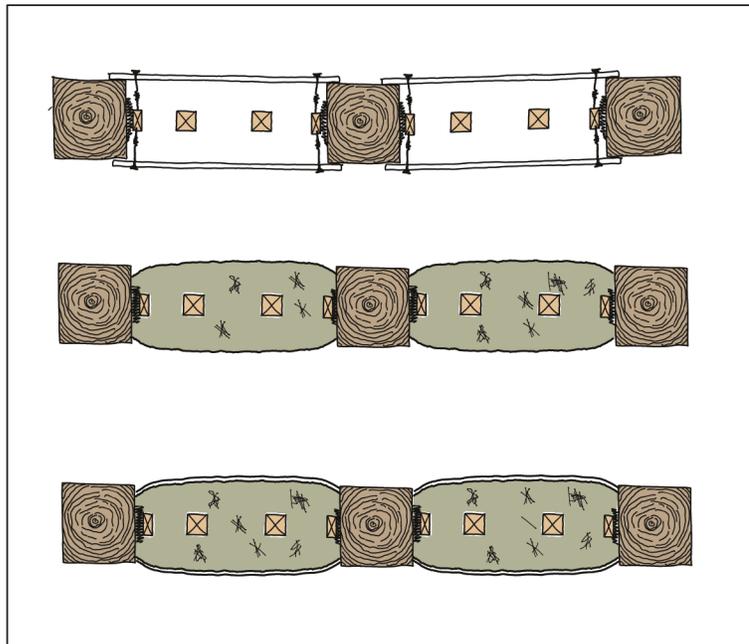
“hempcrete infill in a timber frame with the frame visible on both sides (a) Shuttering fixed prior to placing. (b) shuttering removed and hempcrete shaped back adjacent to main timbers. (c) Finishes applied, closed into main timbers.” (recreated from Stanwix and Sparrow 2014, 276)
